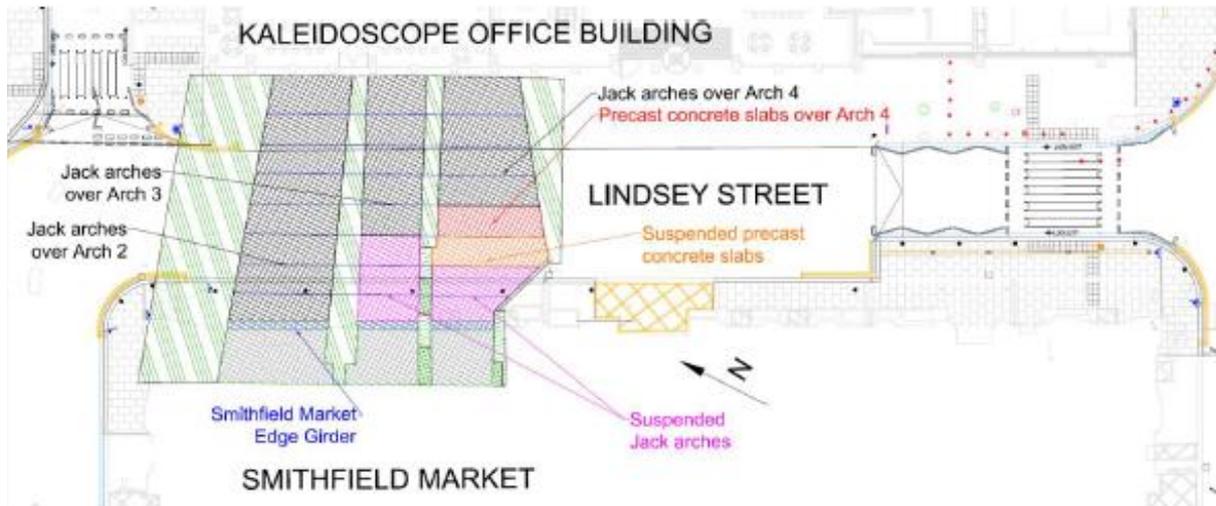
Schematic plan view of Lindsey Street Bridge (Structural arrangement under western footway is inferred from limited available information).
